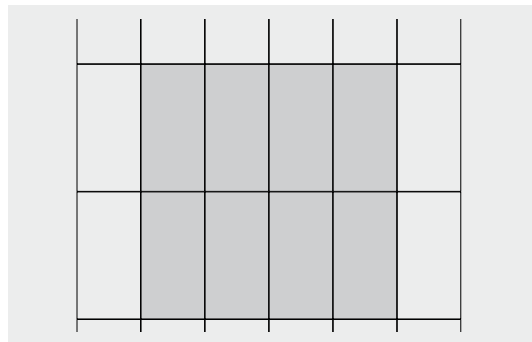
Typical Top Hat set-out - 1200mm Width Vertical Panels with 8mm Joints shown
